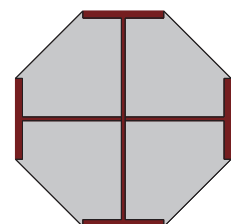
Concrete-confined Effect of Octagonal-section SC Column Member⁴⁾
